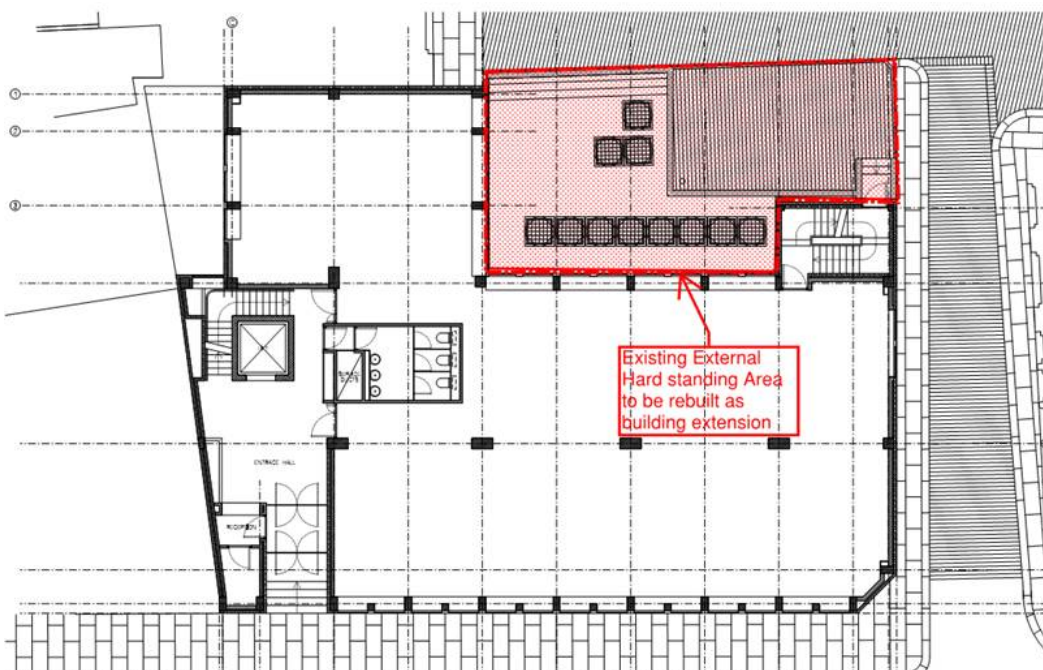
Existing ground floor plan – Source: GROUPWORK Architects
